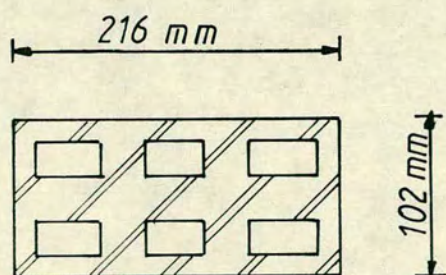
Beam Section of L.S NG⁽³⁾
